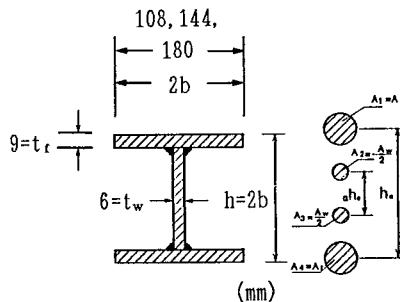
Four-bar Model for H-shaped Cross-section Tested
